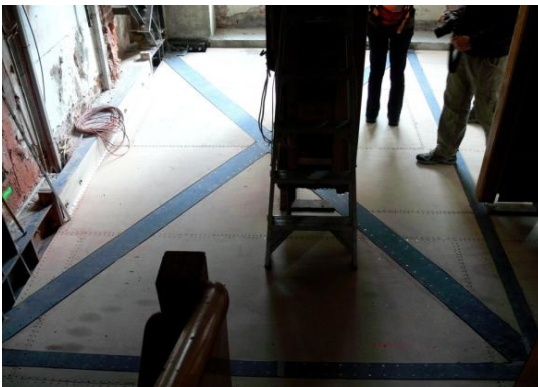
130 Hereford Street, floor diaphragm strengthening.
